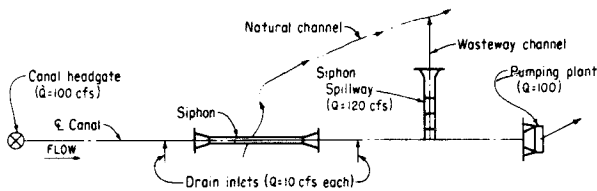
General plan of typical canal with siphon spillway. 103-D-1301
